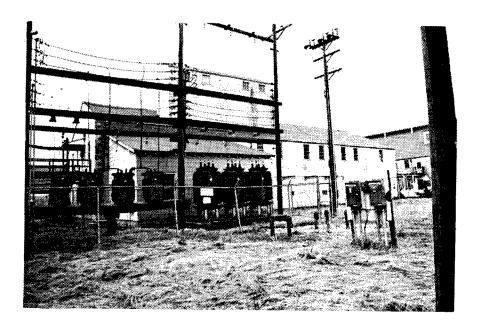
Building 4022: Beater House where the acid accompanying the nitrocellulose was neutralized. The frame walls and roof are supported by a concrete foundation and the tub floor is wooden.
